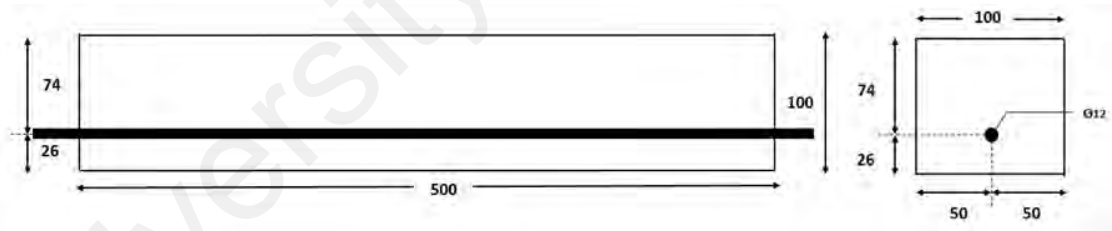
4: Details of the beam specimen for experiment 2 and 3 (units are in mm)
